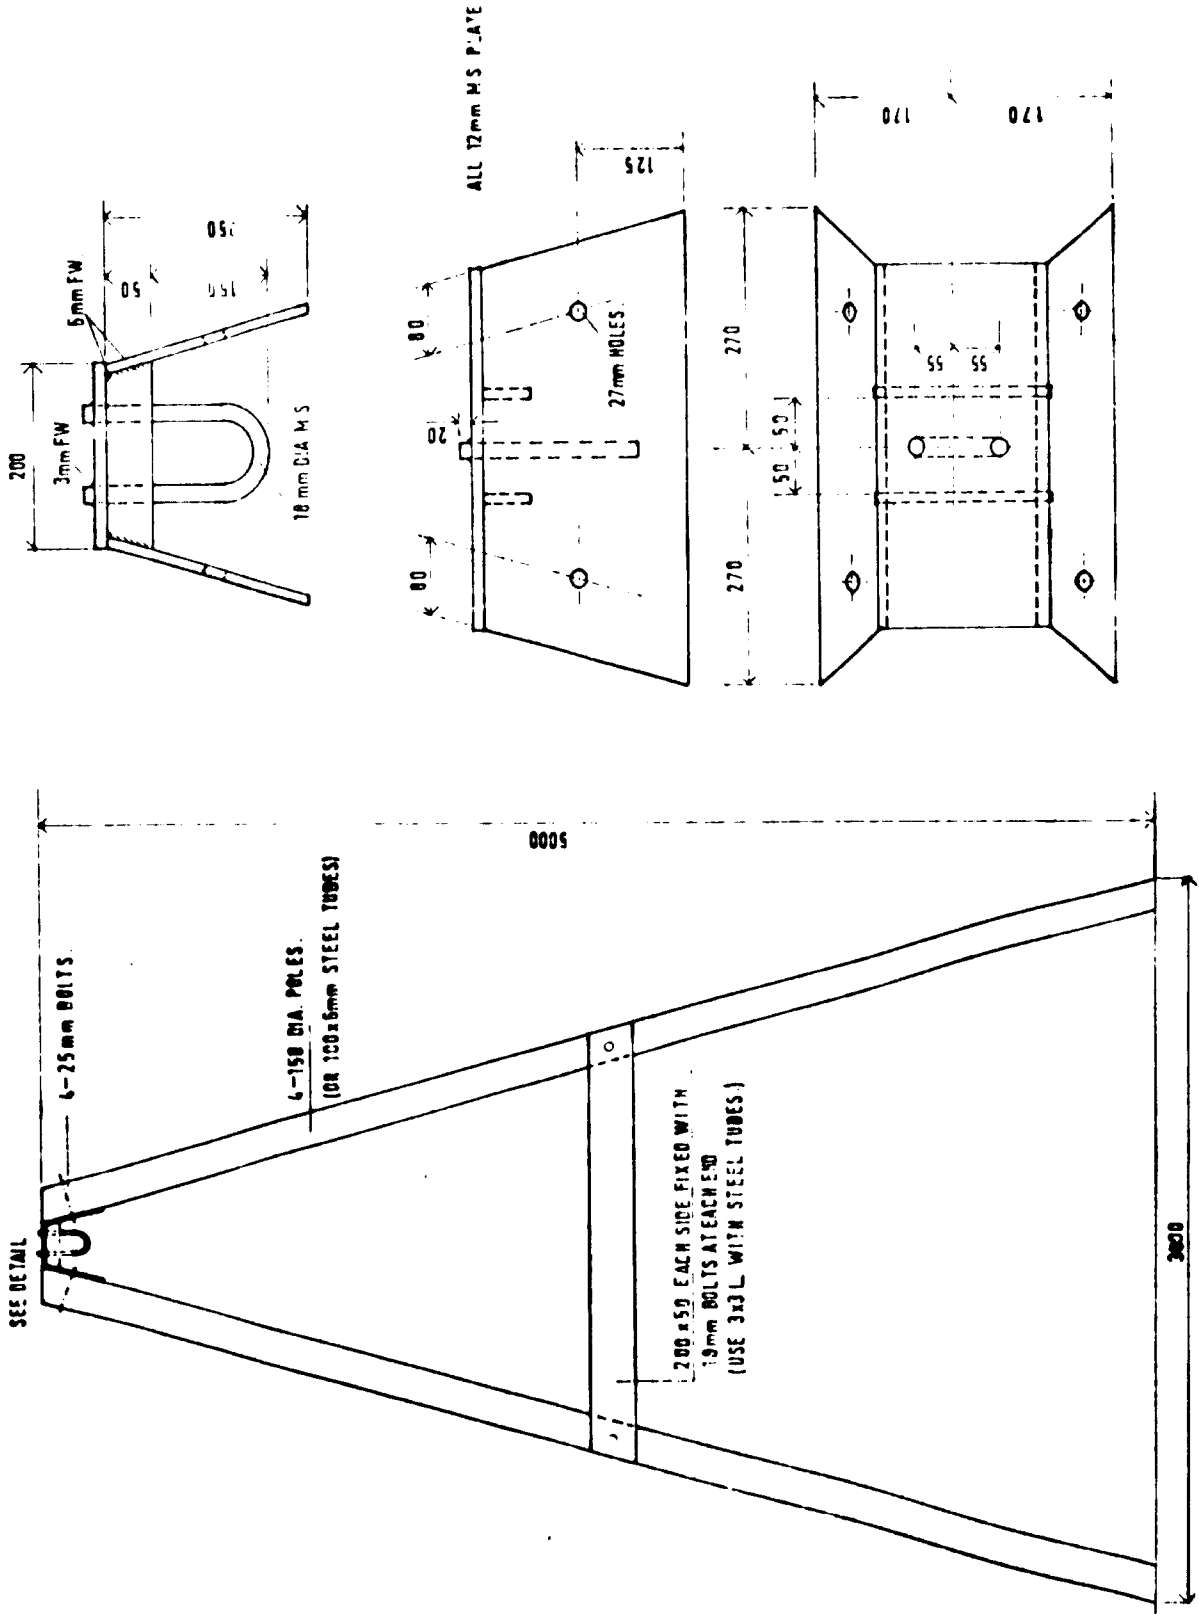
System for the establishment of cable anchorage and assembly of trusses (wet crossing)
